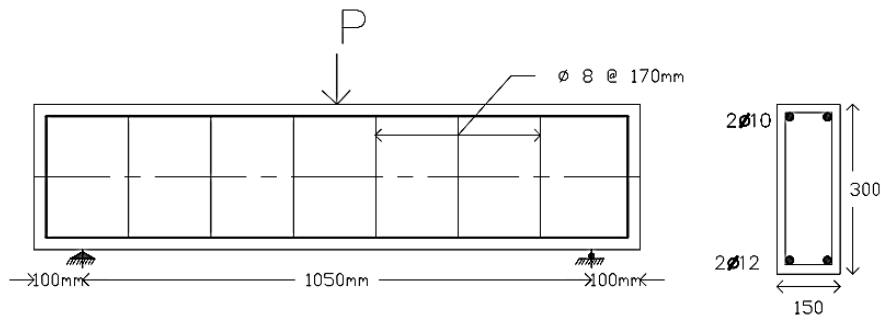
Reinforcement details of non-prestressed concrete beams without (CNT)
